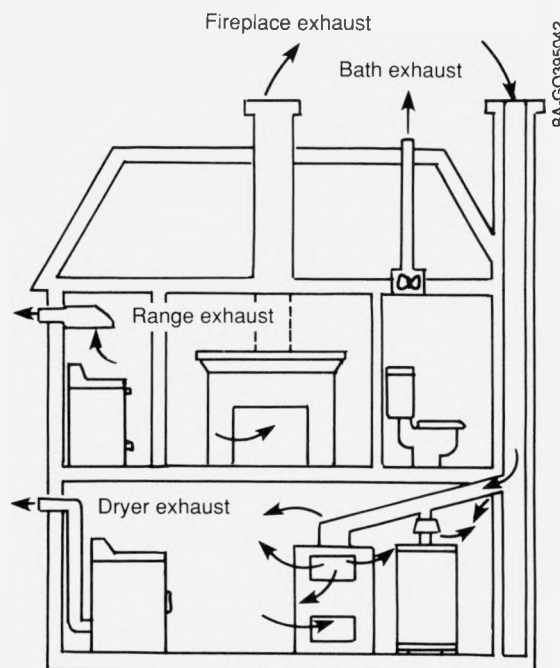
Chimney backdrafting occurring when house depressurization from exhaust reverses the chimney draft. (Source: Adapted from Lischkoff, James K., and Joseph Istiburek, 1986, *The Airtight House: Using the Airtight Drywall Approach. A Construction Manual*. Ames, IA: Engineering Extension Service, Iowa State University)
